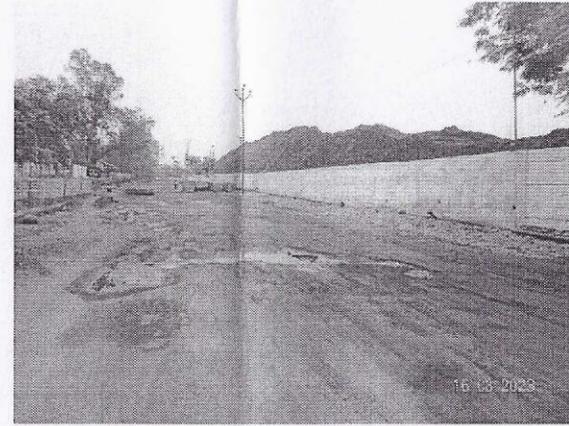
& 38: Photo of pucca wall constructed in east and south east and relative clean road there. New plantations can also be seen.
